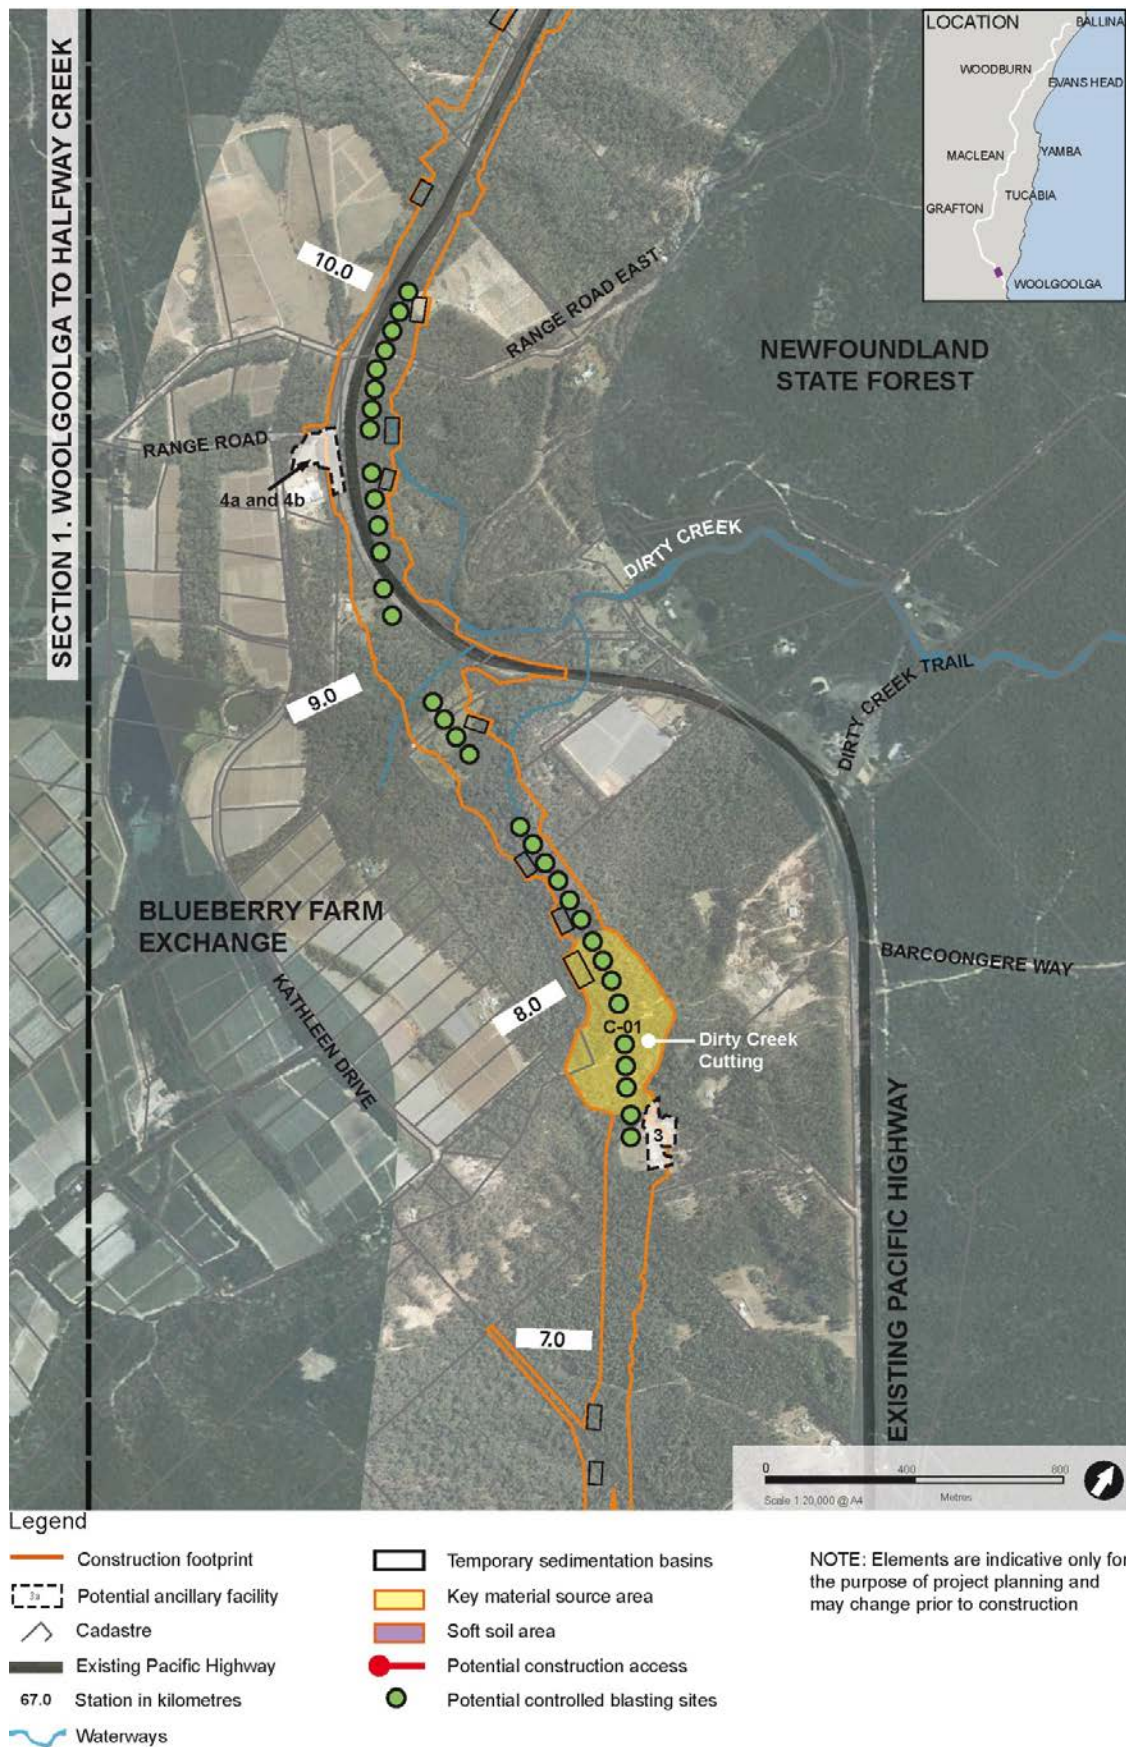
Extent of construction and construction features Section 1 (Station 6.7 to 10.7)
